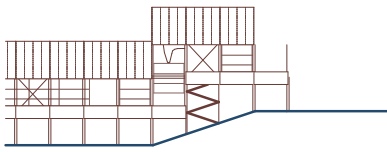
Detailed Section, Level of Detail 1:20 (scaled)
